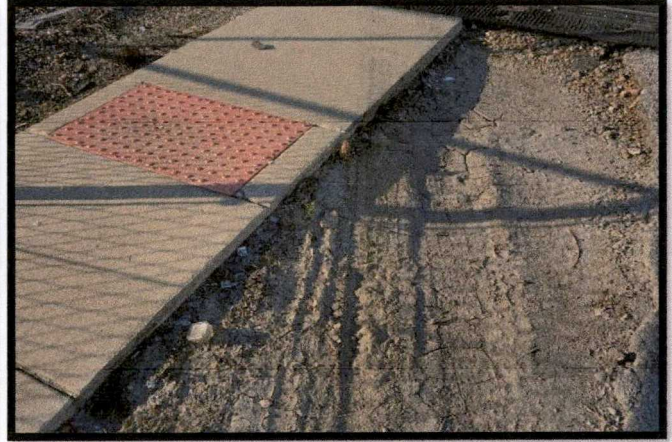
ADA-compliant access ramp at end of sidewalk near railroad tracks.
